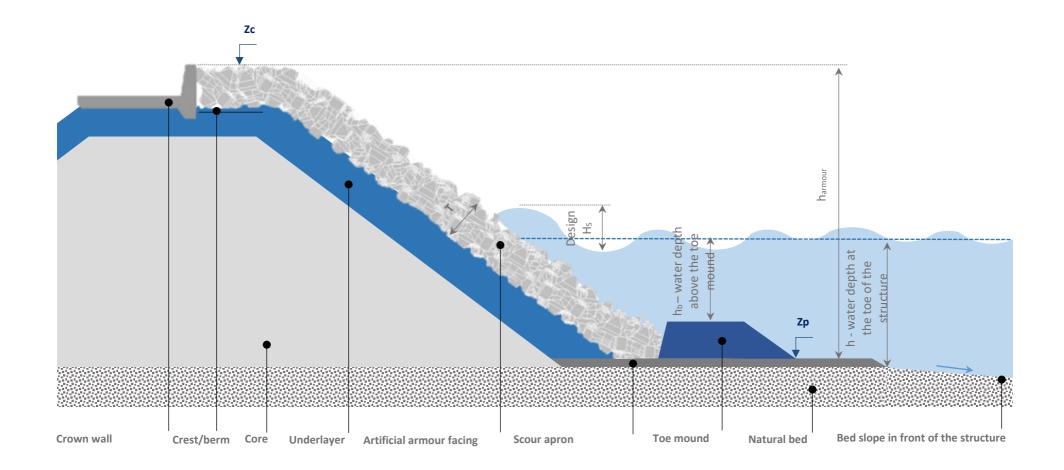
Typical cross-section of a breakwater with a single-layer armour facing
